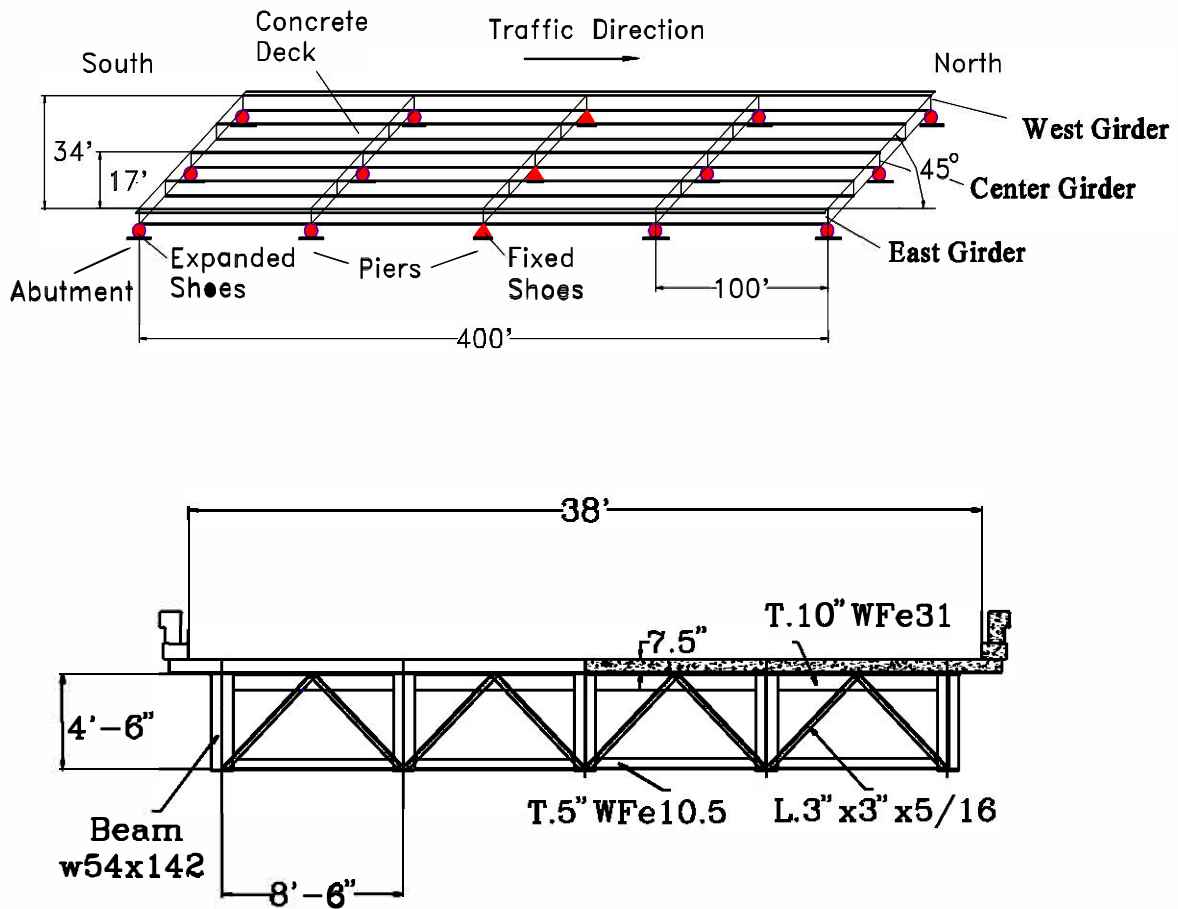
Layout and Cross Section of the Superstructure, Walnut Creek Bridge on I-35, Oklahoma
